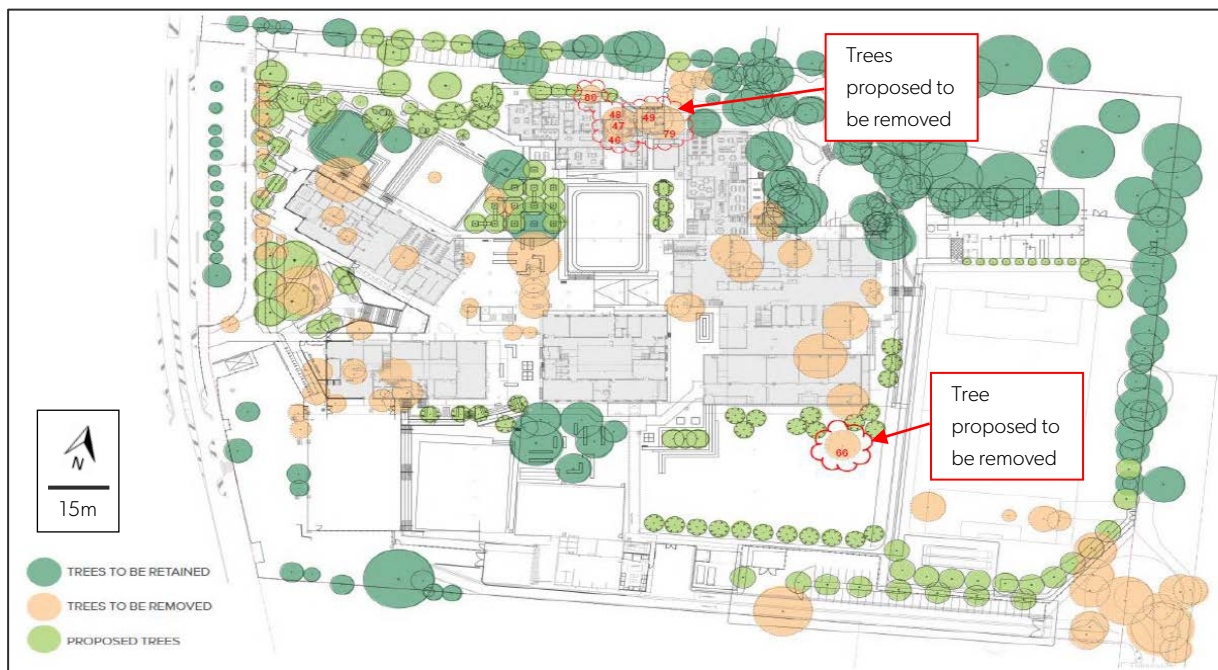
| Trees proposed to be removed (source: Section 4.55 Modification Application, 2019)
